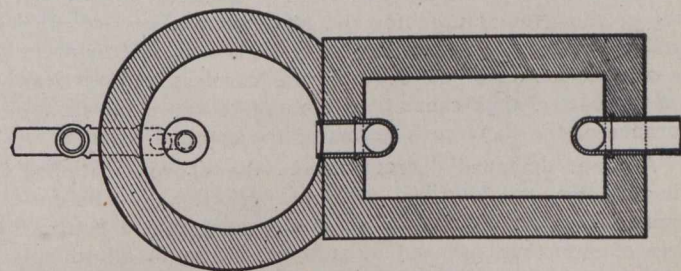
Sectional Plan, Showing Settling or Septic Tank and Dosing Chamber.
